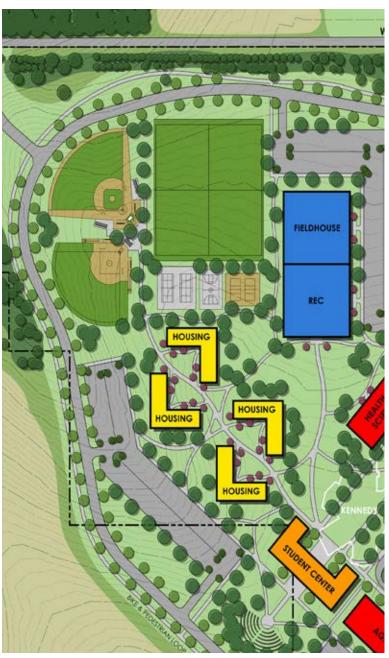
B DETAIL: Beatrice Campus Master Plan Housing & Recreation
